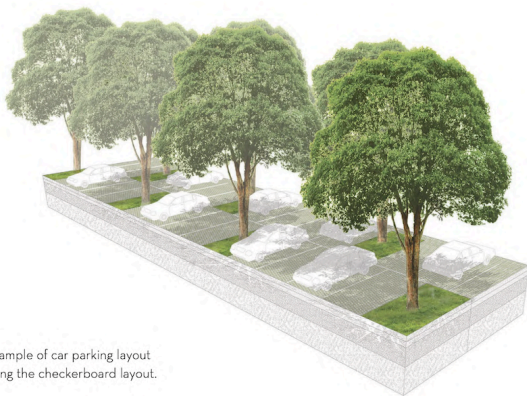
Example of car parking layout demonstrating the checkerboard layout.
